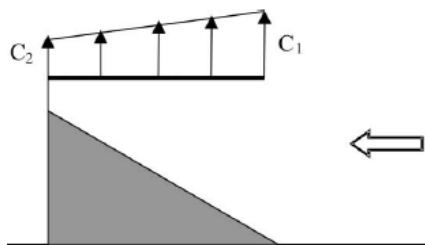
CANTILEVERED ROOF AND CANOPY
